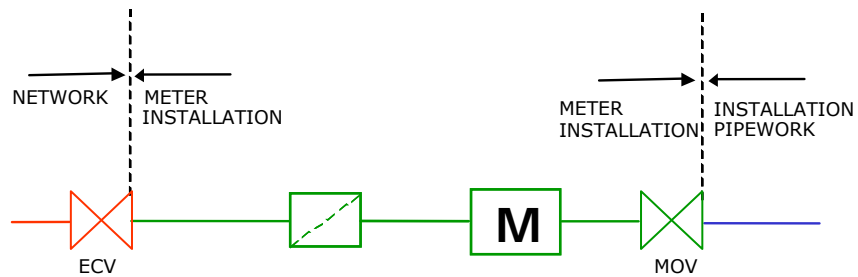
RECOMMENDED ARRANGEMENT.
